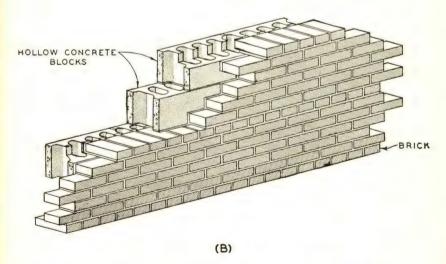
Pictorial Views of Brick Veneer on Frame and on Concrete Block Walls
